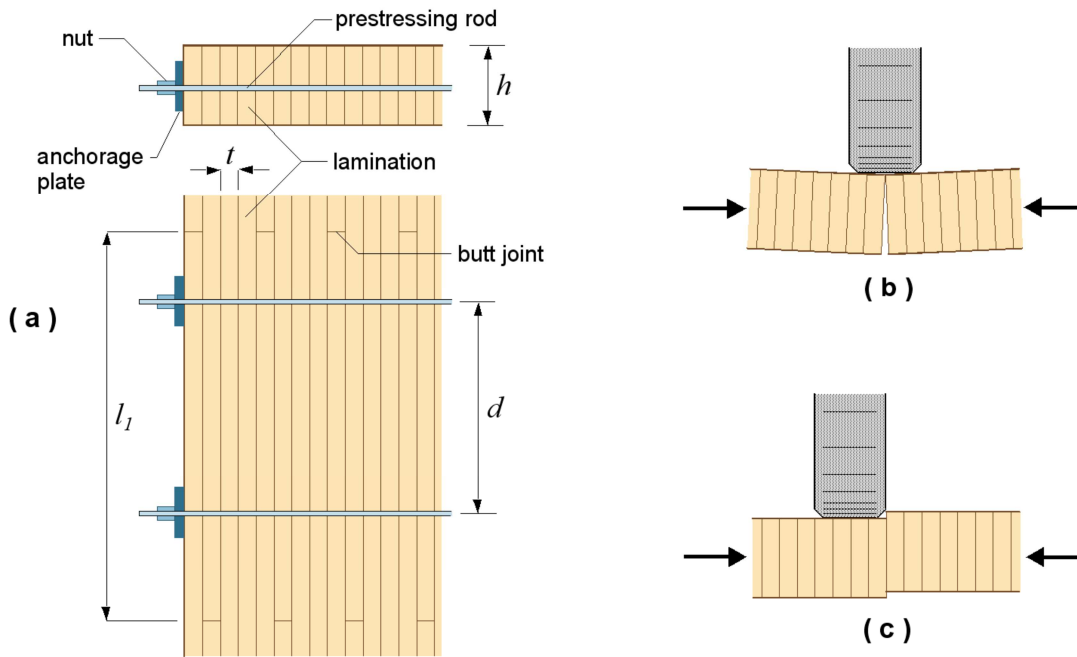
Stress-laminated timber deck plate (drawing: K. Bell)
